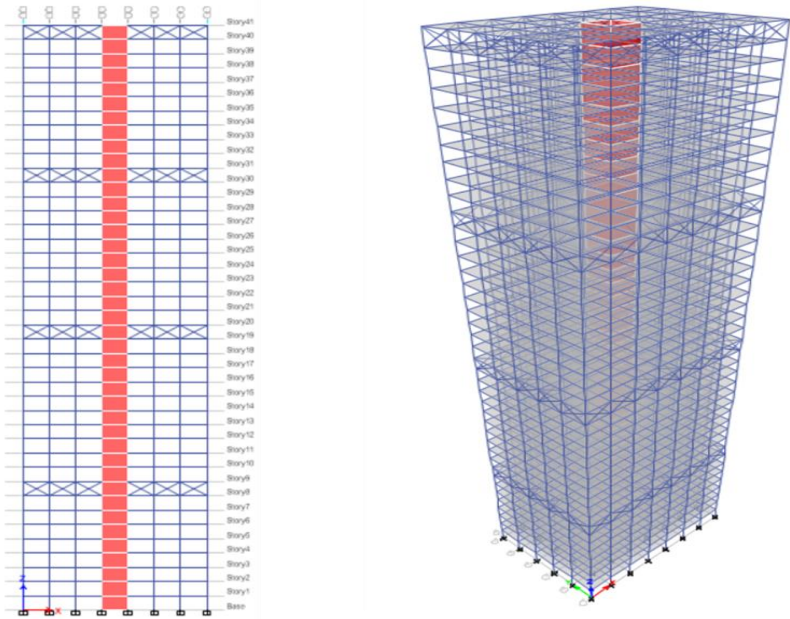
Model of G+40 Building using outriggers by X type bracing positioned at 8th, 19th, 30th, 41th Story
